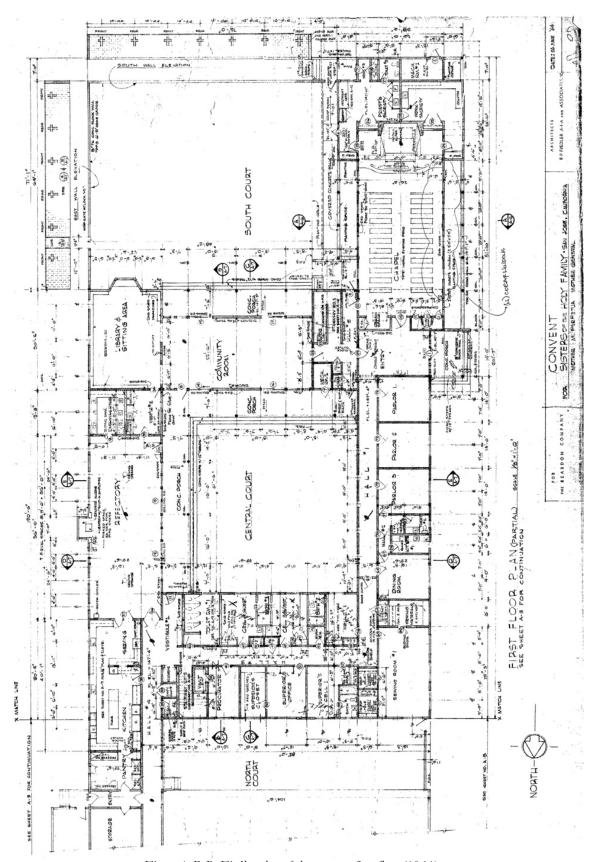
R.P. Fiedler plan of the convent, first floor (1964)
